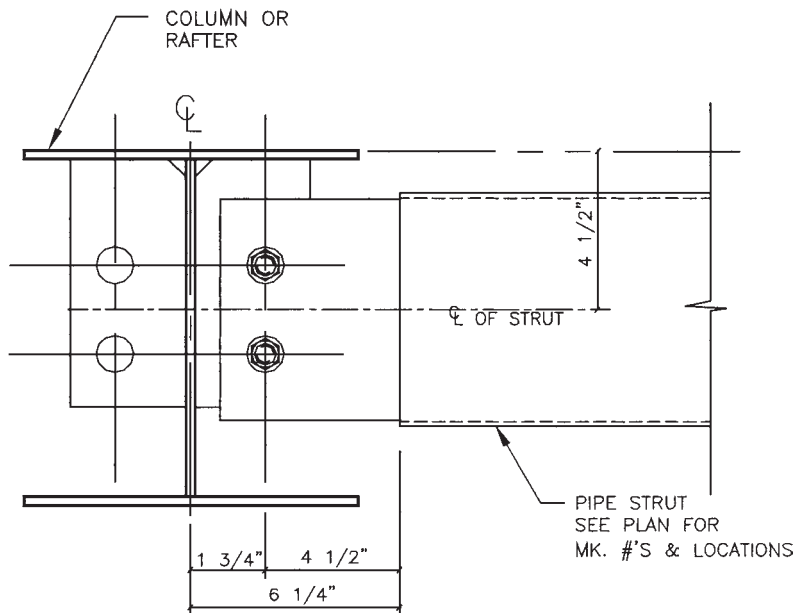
Detail of pipe strut attachment to column or rafter. The manufacturer recommends using two 1-in-diameter A 325 bolts. (Nucor Building Systems.)
